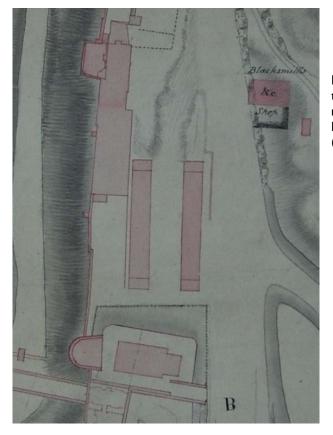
Detail from plan of 1806, showing the two stables running north-south, the magazine to the south and the Cinque Ports Prison built against the curtain wall. (NA MR 1 845, 1806.)
